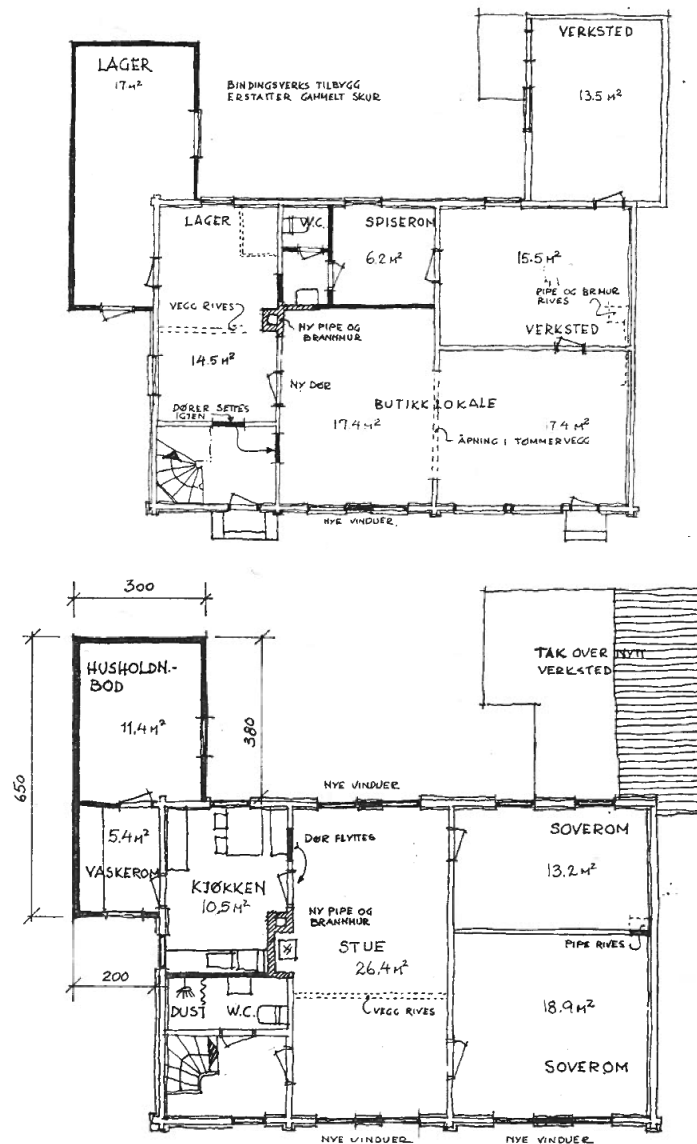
Ground floor shop area survey (top) and upstairs apartment (bottom) plan drawings by architect Bjørn Grimsby 20.2.1978. Timber walls were suggested to be removed on both floors to restructure the space and create large rooms. (Bjørn Grimsby, Vefsn municipal building archive and Dag Nilsen private archive)
